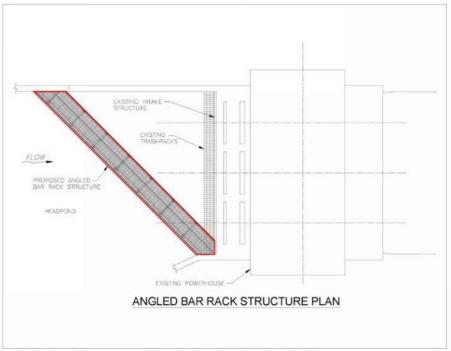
ANGLED BAR RACK STRUCTURE - PLAN VIEW
